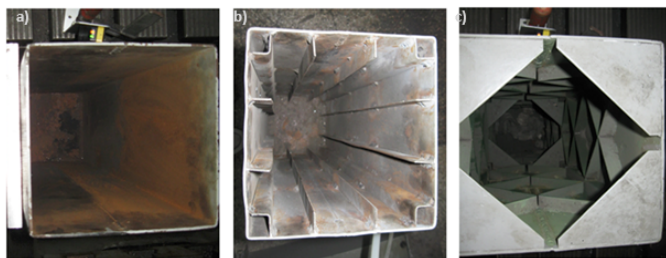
a) Column without stiffeners, b) column with longitudinal stiffeners c) column with complex stiffeners.
